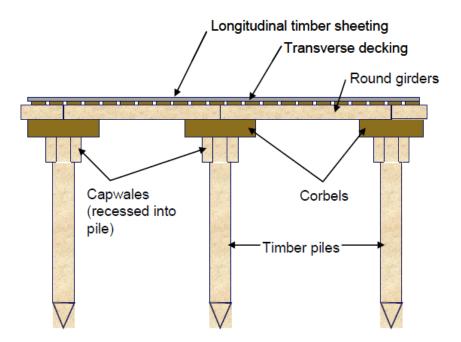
A typical side view of a timber beam bridge. (Carter 2009)
